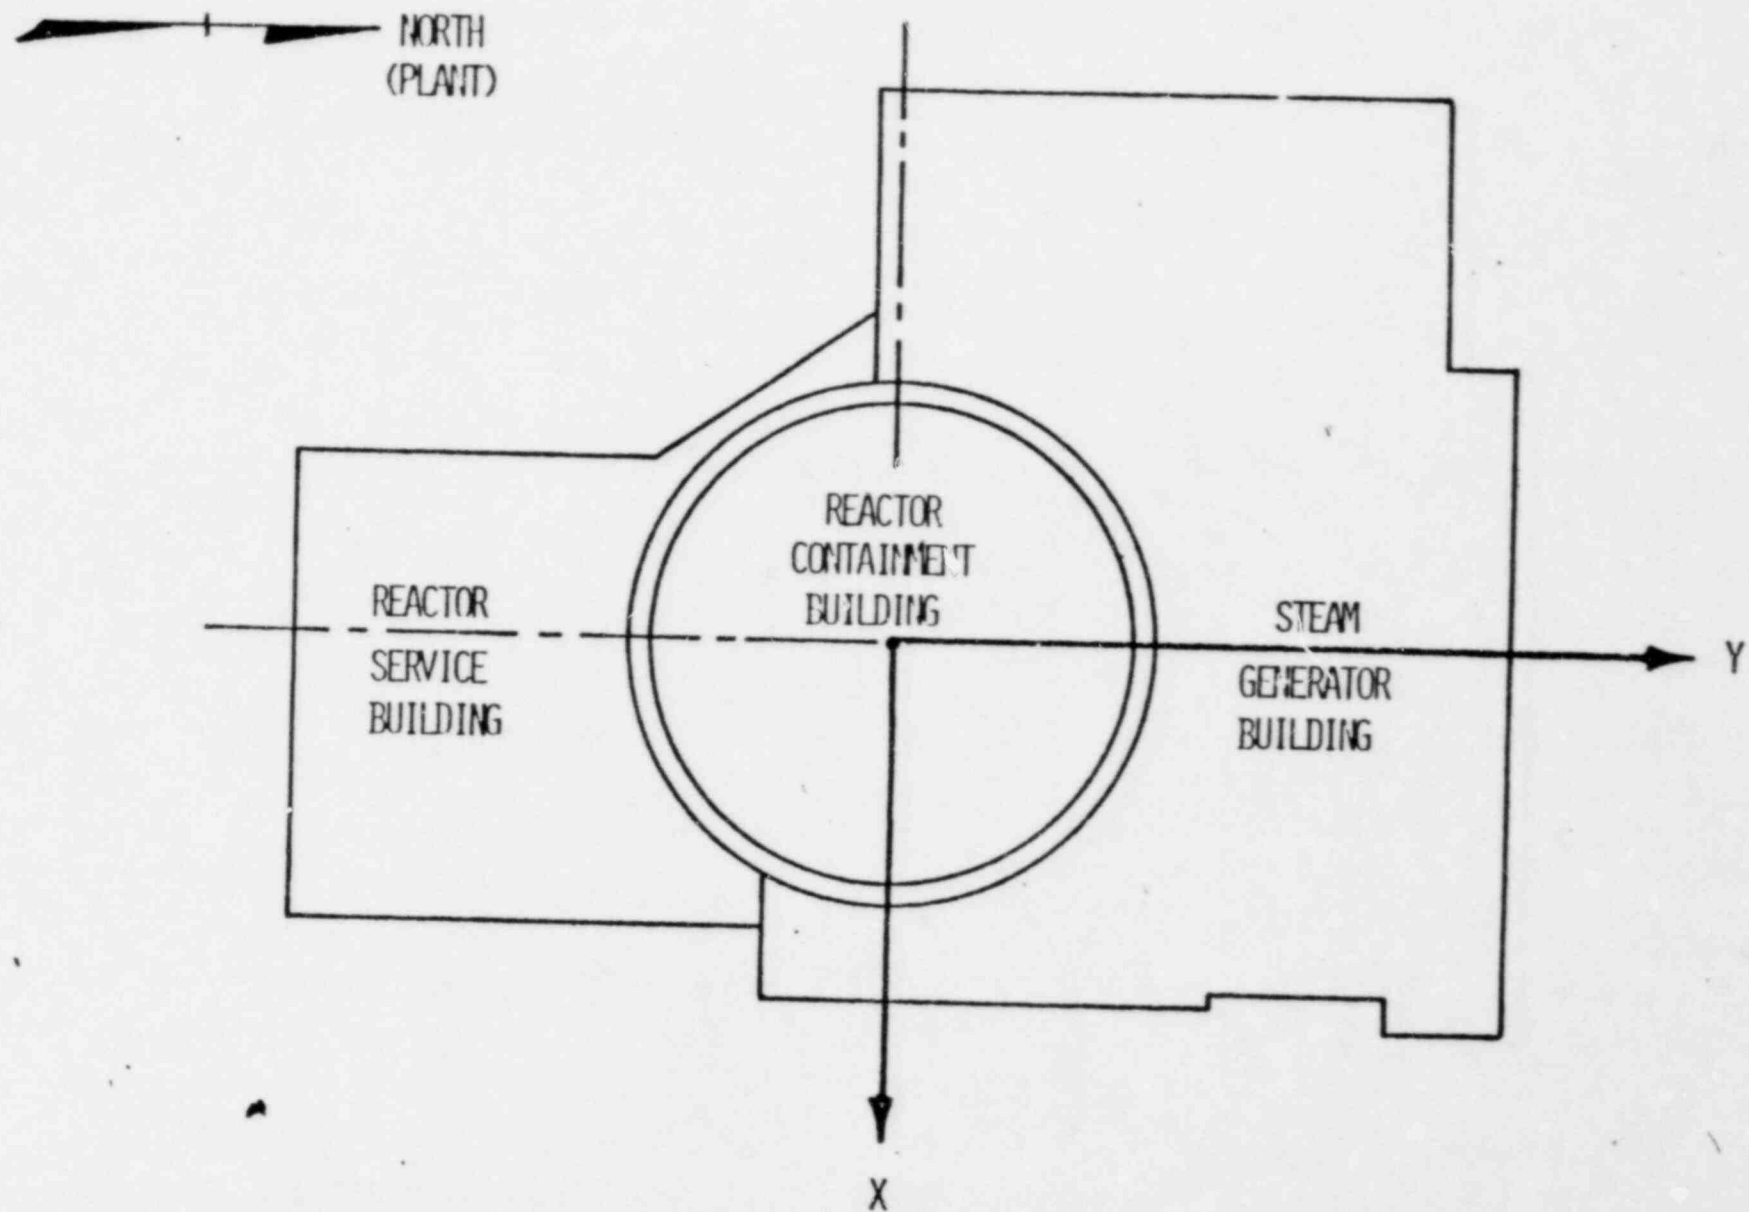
CRBRP BUILDING NODES COORDINATE SYSTEM - PLAN
